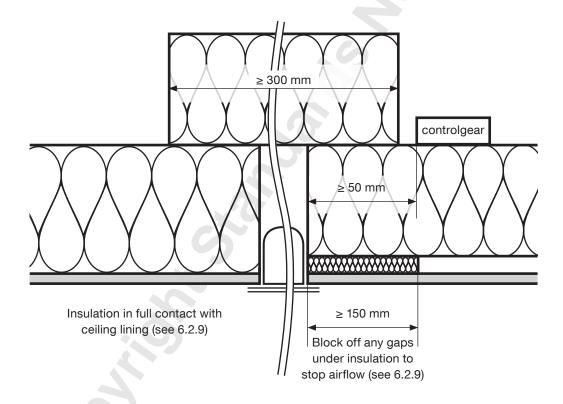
Installing ceiling insulation around recessed luminaires of the type IC, IC-F, and IC-4 where the luminaire manufacturer's instructions are not known
